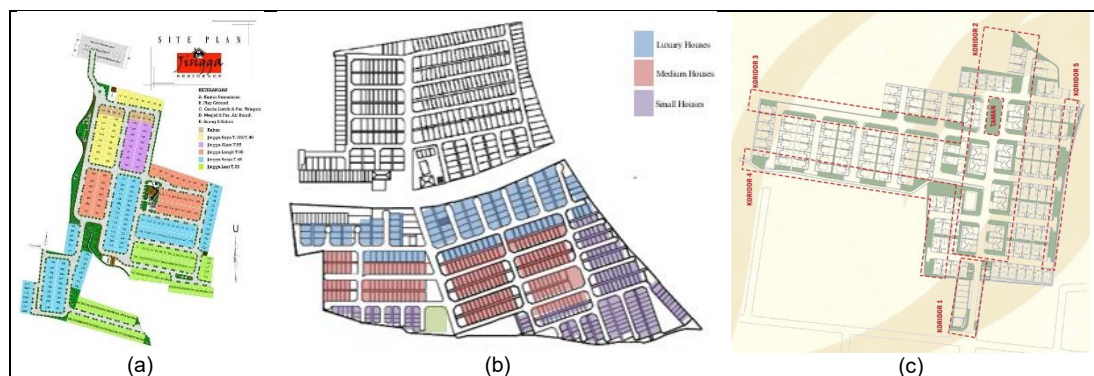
(a) Bumi Adipura Siteplan; (b) Jingga Residence Siteplan; (c) Green Caraka Residence Siteplan
